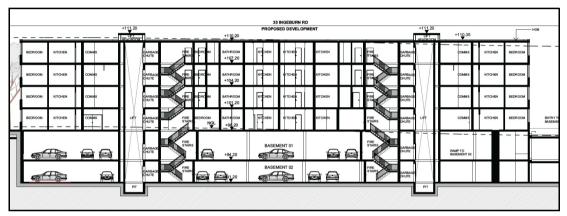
Extract from Section AA of the development plans which shows the non-compliance of the lift overrun and a small section of Building C with the 12 metre height of buildings development standard of SEPP 2006.
